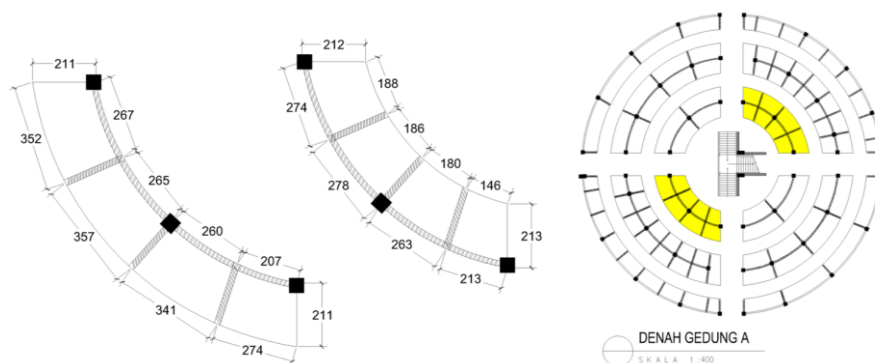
Two-Faced Four-Row Stall Layout Block 1 (Building A) (source: author)
